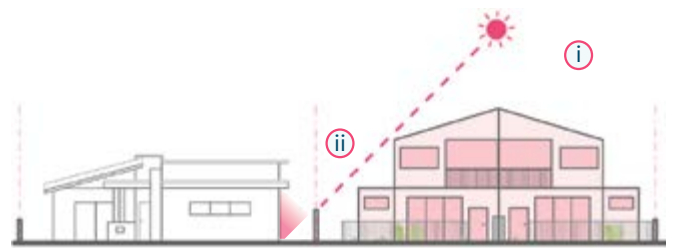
Minimise overshadowing of adjacent dwellings and private open space.
